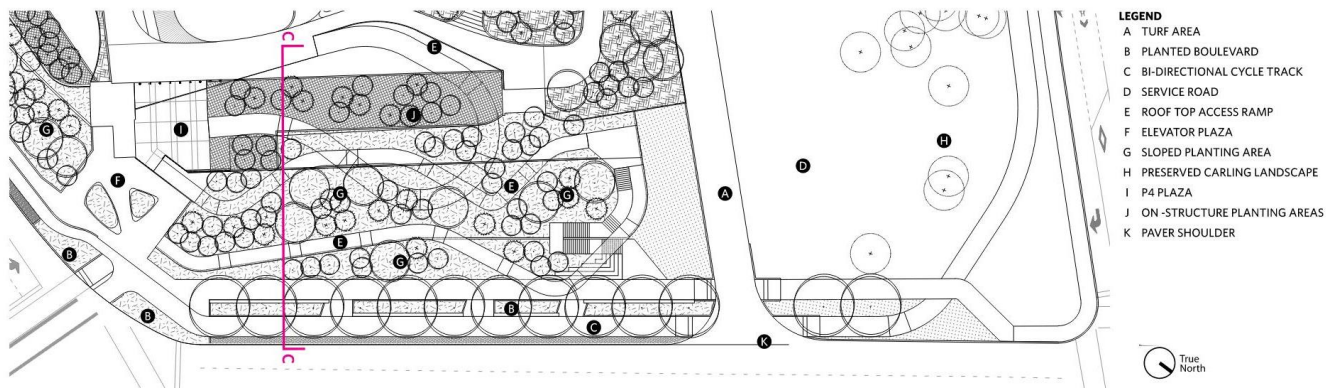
shows a plan view of the recreational path. Some of it is on grade and some on elevated structure for a playful, accessible path up to the green roof. The path begins at the southeastern Parking Garage plaza, with adjacent access to elevators if required. A large set of stairs on the northeast corner of the garage face the intersection of Carling Avenue and Preston Street. These stairs provide a shortcut to the recreational path for pedestrians walking down Preston Street. The recreational path is intended to continue the ambulatory experience from the winding path in Commissioners Park, providing access to the green roof of the garage and the future Hospital.
